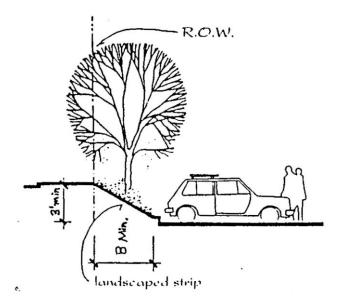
PARKING LOT LANDSCAPED STRIP, OPTION (a)
